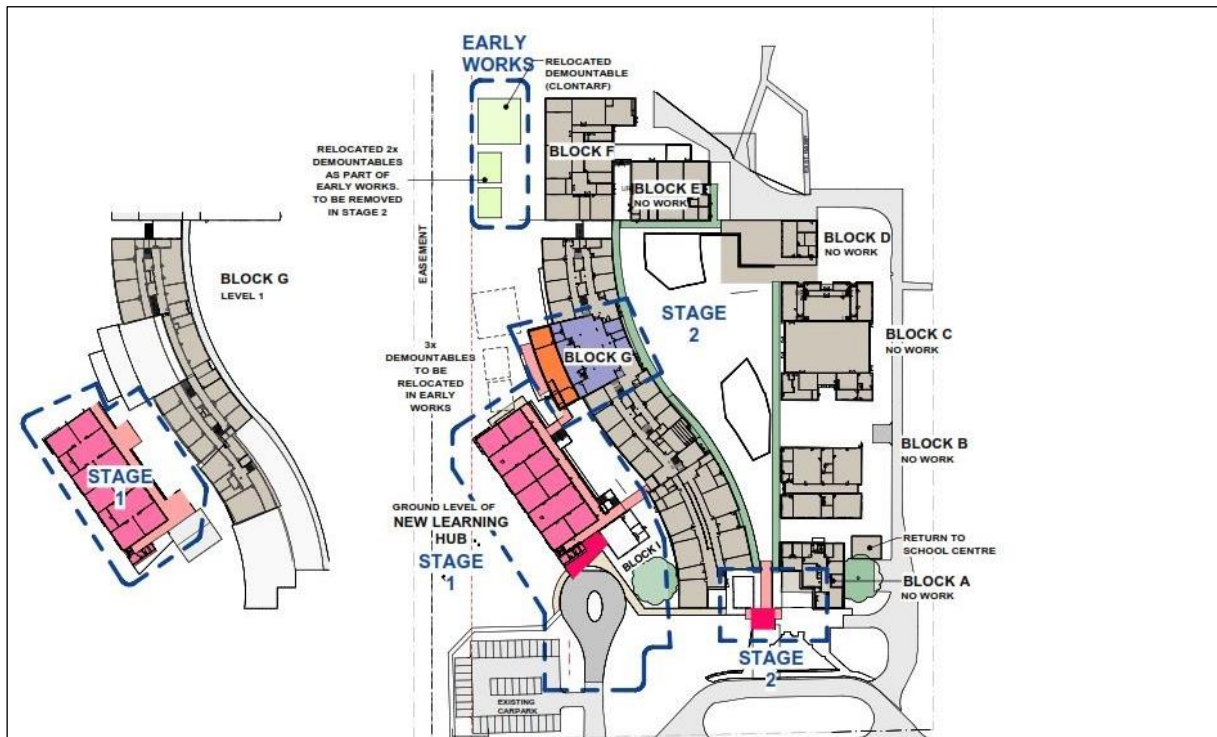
Proposed development, with proposed new learning hub and support unit in pink, library extension in orange and new location of demountable buildings in pale yellow. From EJE Architecture Drawing “Staging Plan”, Drawing No. A-006 Rev L, dated 31 May 2022, provided by APP.
